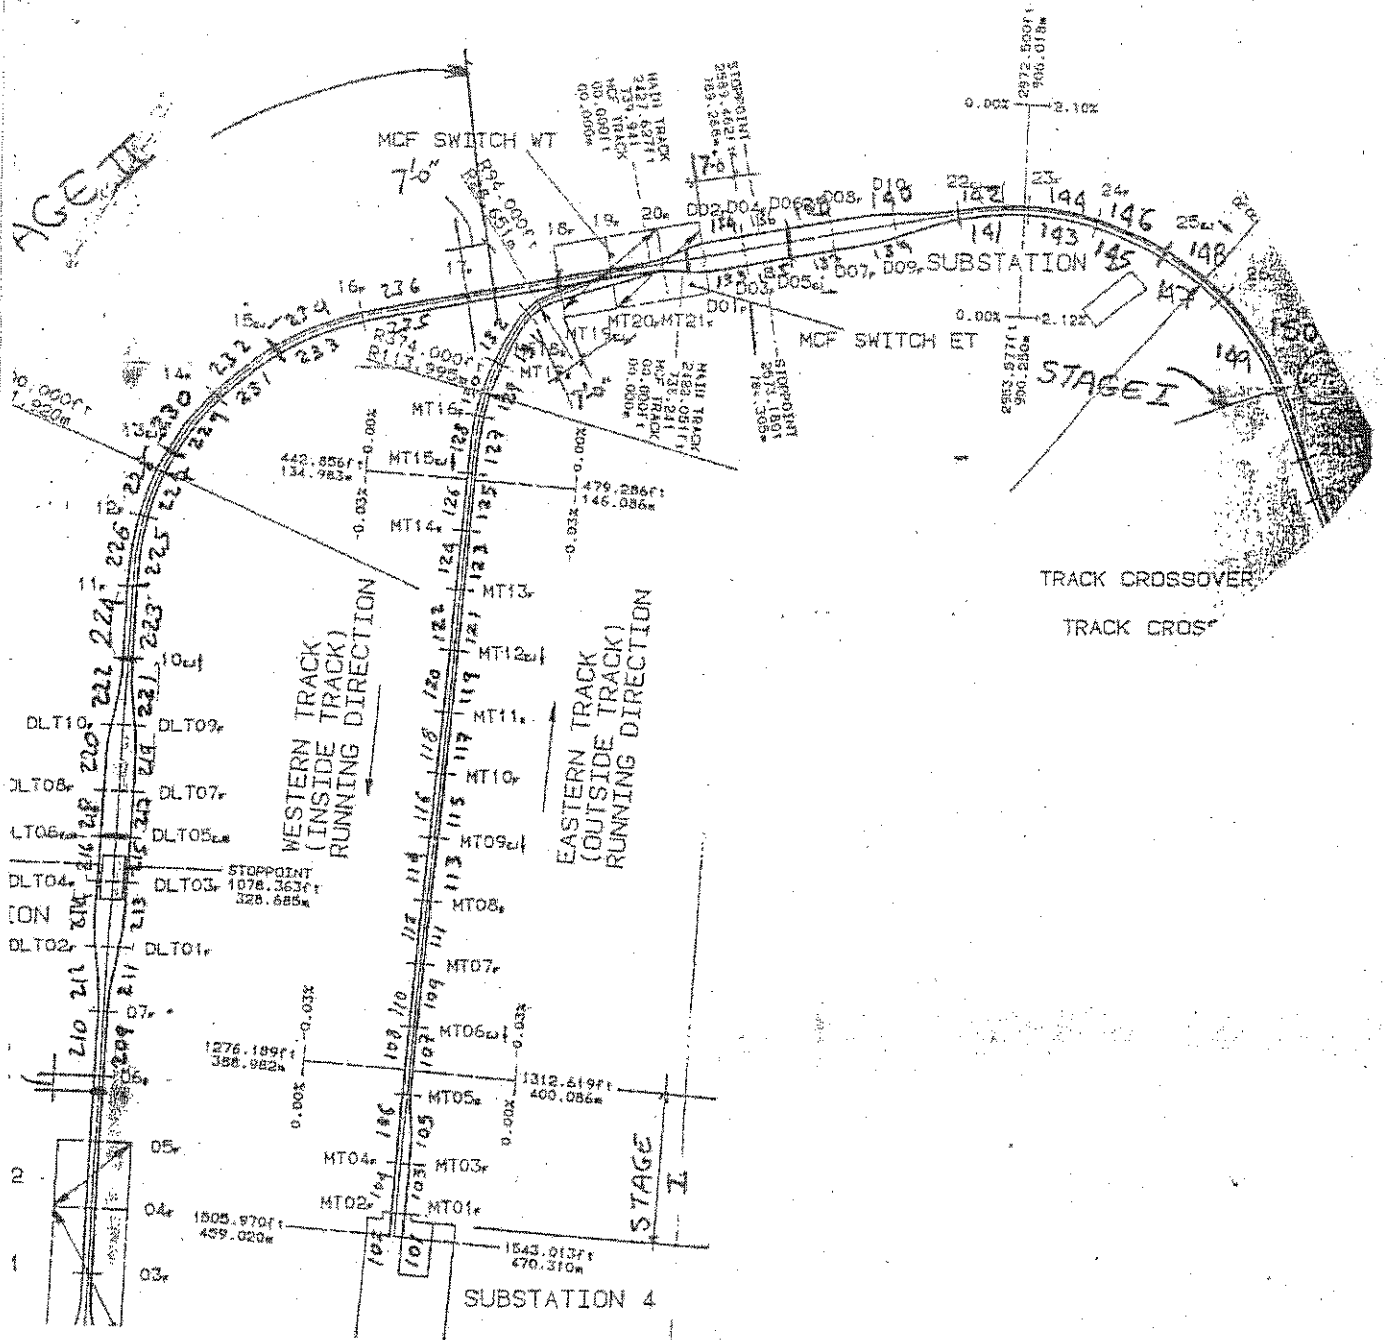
Plan View of Monorail Guideway Showing Instrumentation Locations
